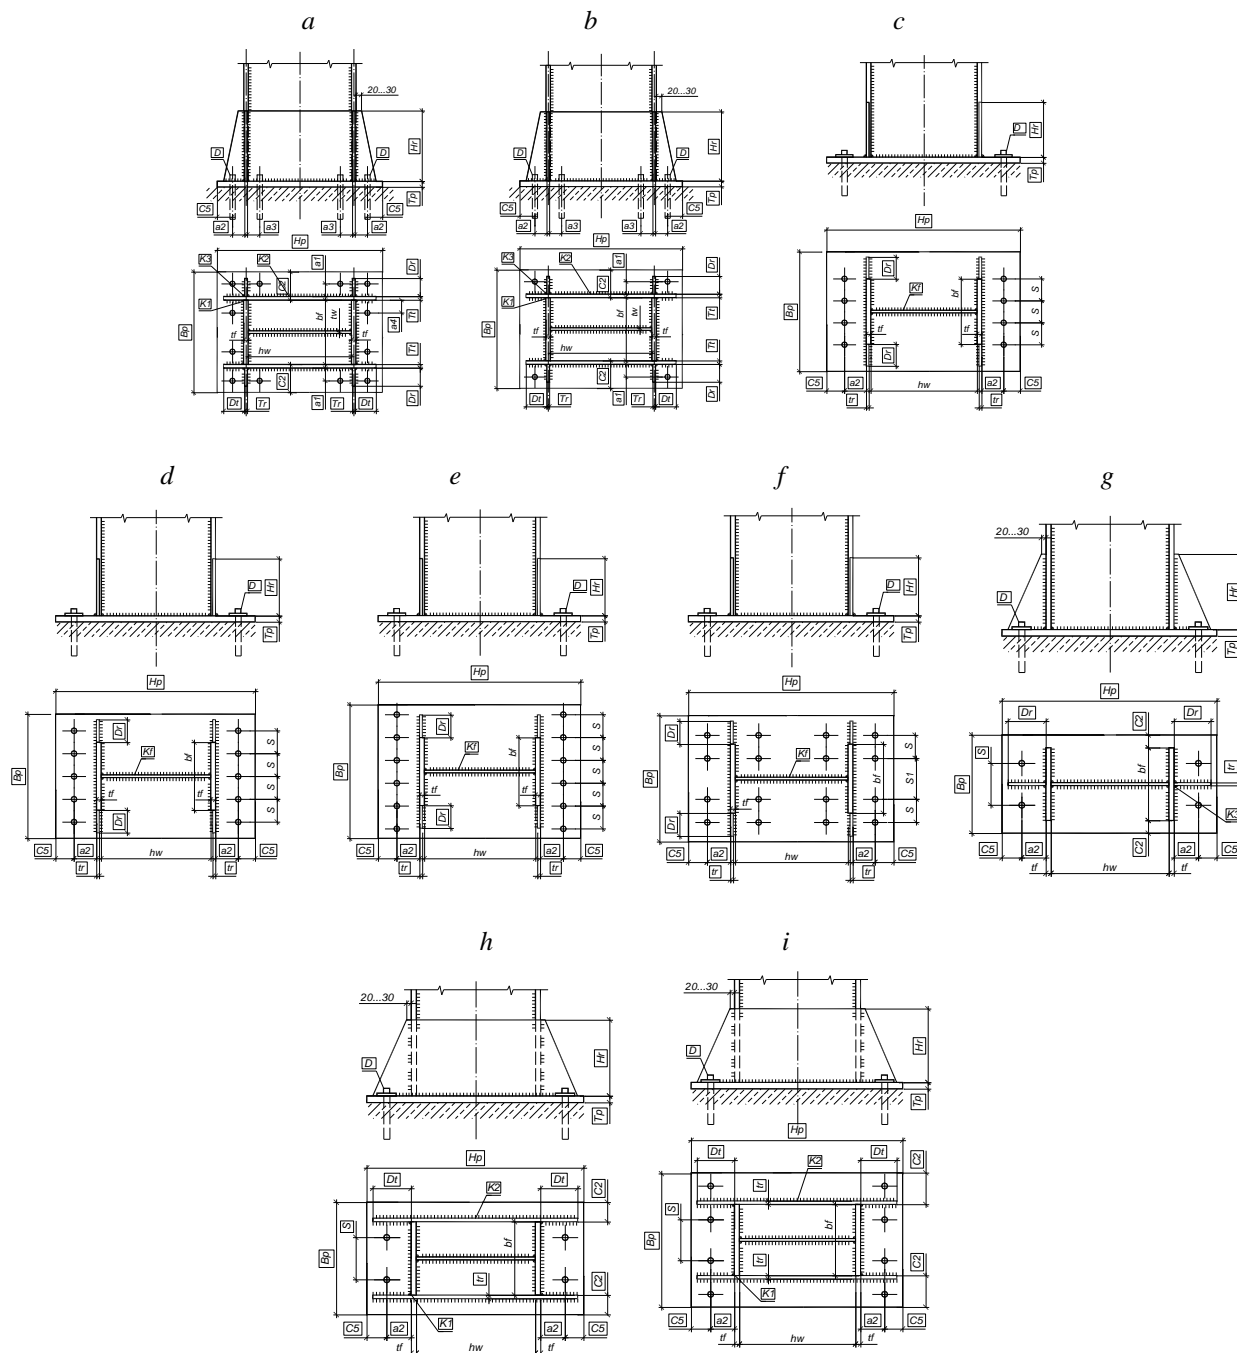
Types of designs for the joints of rigid column bases with wing plates and cantilever stiffeners
